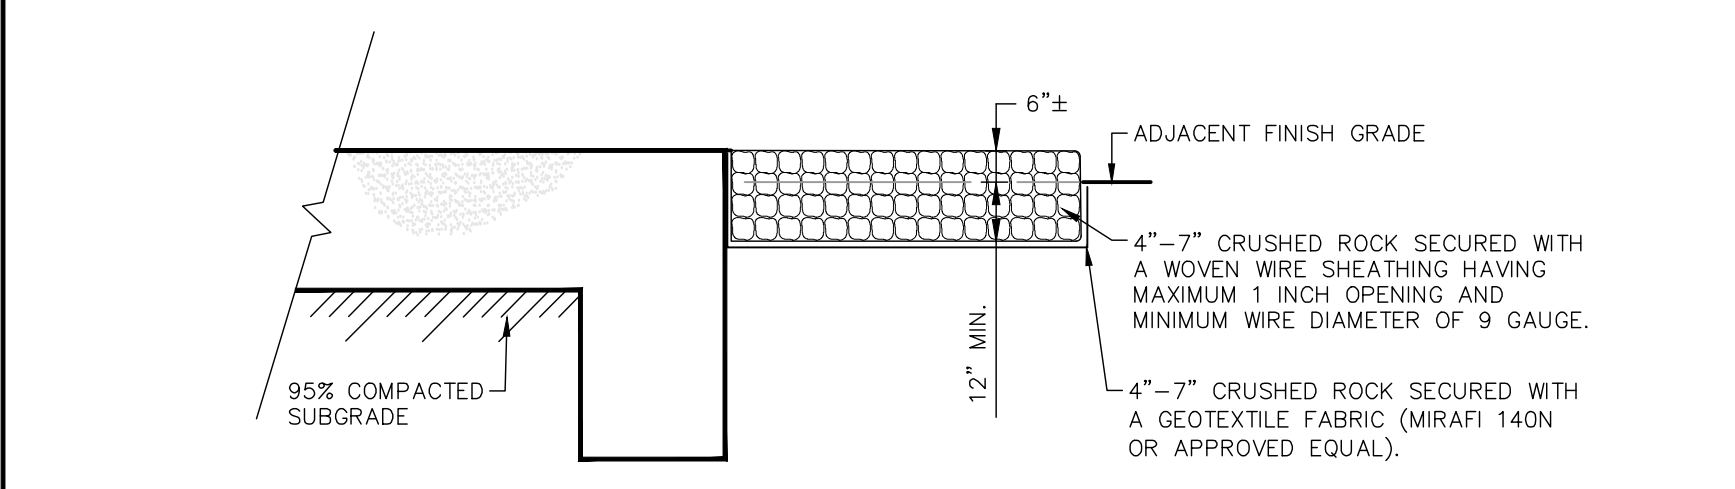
DETAIL 'A': ENERGY DISSIPATOR SECTION DETAIL (N.T.S.)
